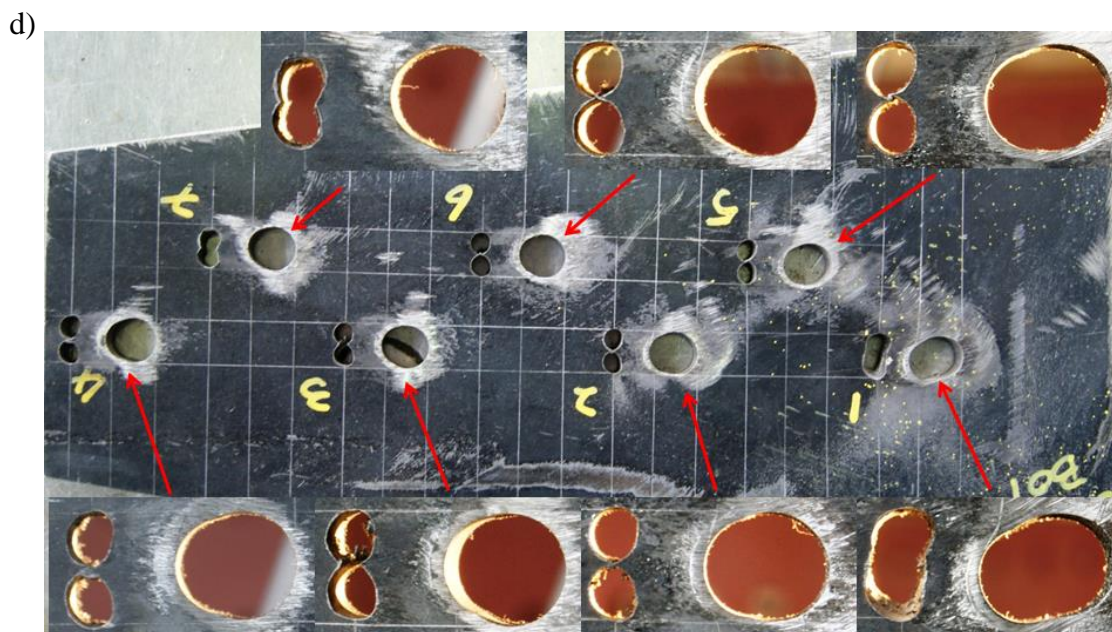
Specimen No. 4 - Observed damage after the test: a) relative displacement between the brace and the gusset plate; b) fracture plane; c) & d) local inelastic deformations near the bolt holes in the top (c) and bottom (d) gusset plates (continued)
